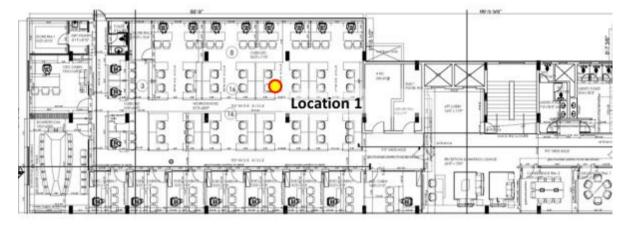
Floor plan showing the monitored locations at Building 5-Bangalore
